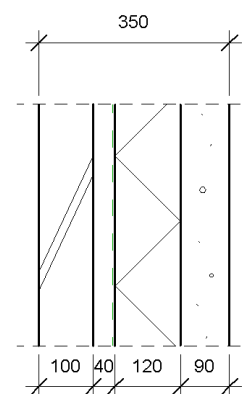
DESIGN 2 CAST IN SITU CONCRETE
